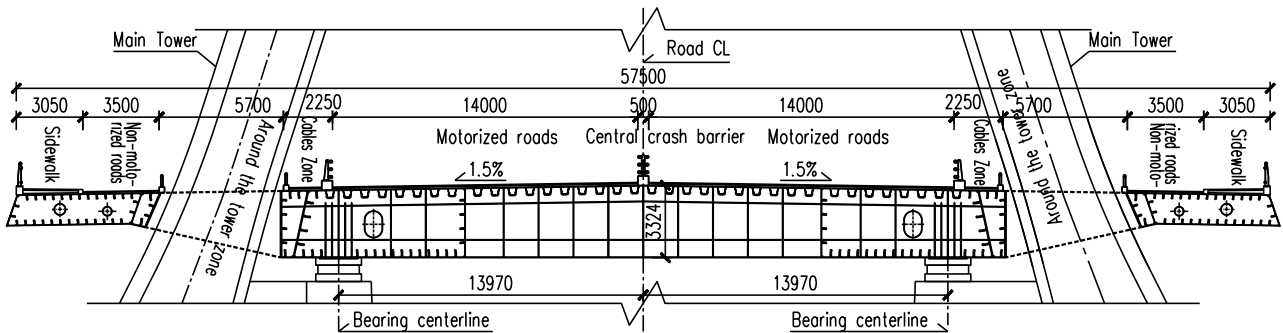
Cross-section of the around-pylon segment of the cable-stayed bridge (Unit: mm)
